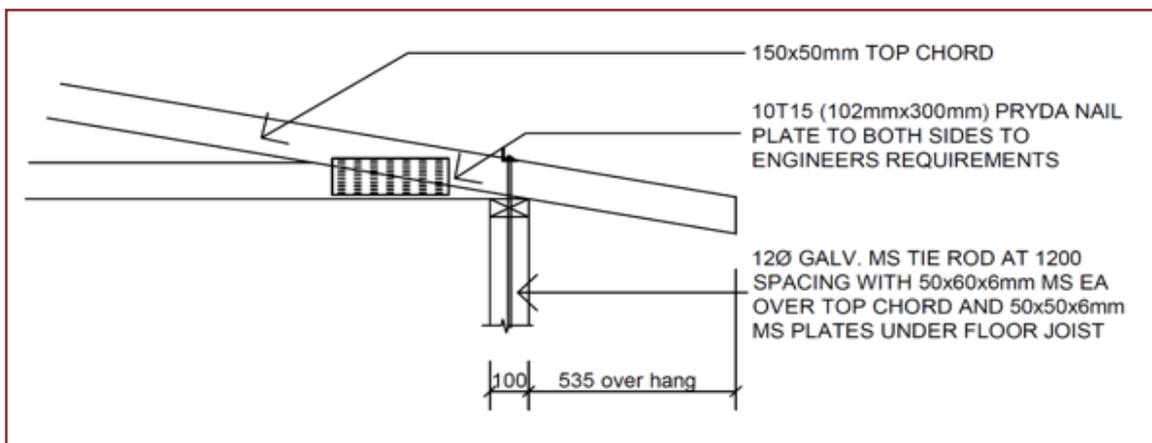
Connection of wall frame to roof frame (Source: Fiji Rural Housing Unit drawings)
